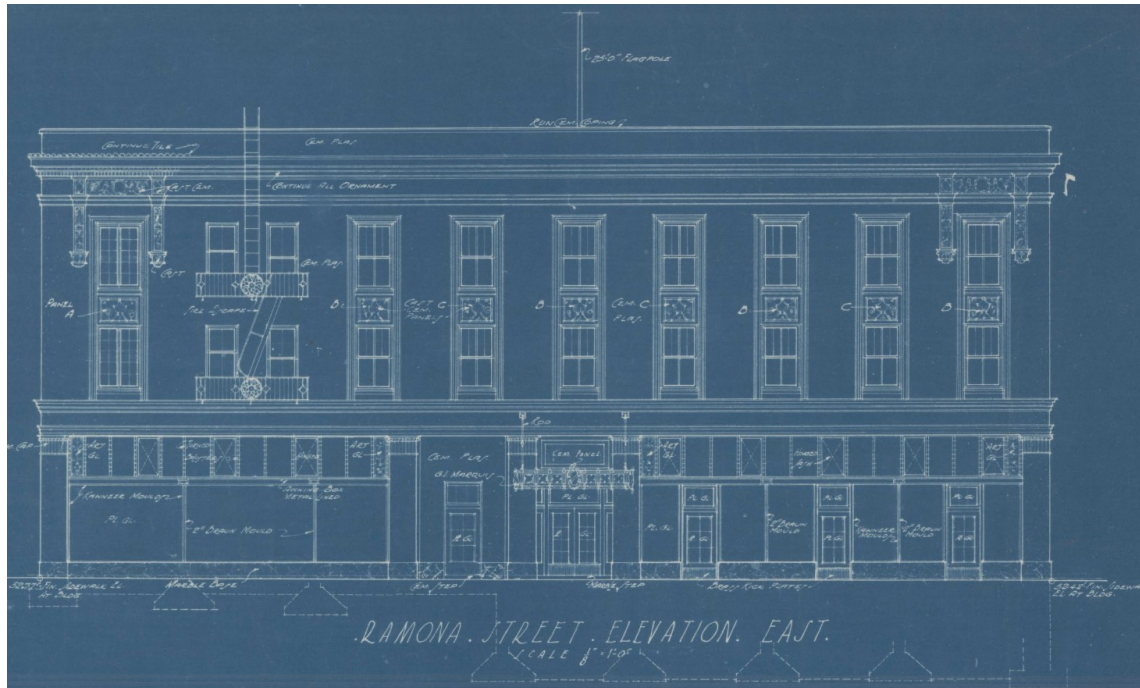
Blueprints of the secondary façade elevation, 1924. Source: Birge Clark Architectural Papers, Stanford Digital Repository.
